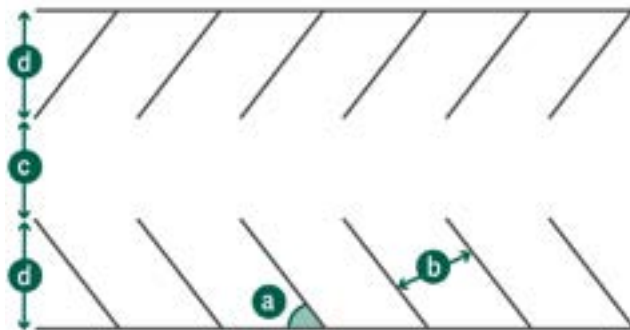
MINIMUM BARRIER-FREE PARKING STALL DIMENSIONS
